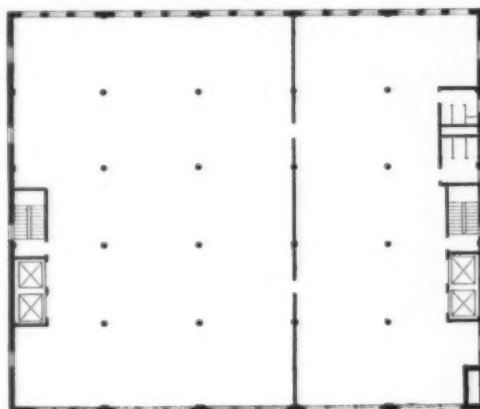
Floor plan of typical loft building showing fire wall with doorways.
